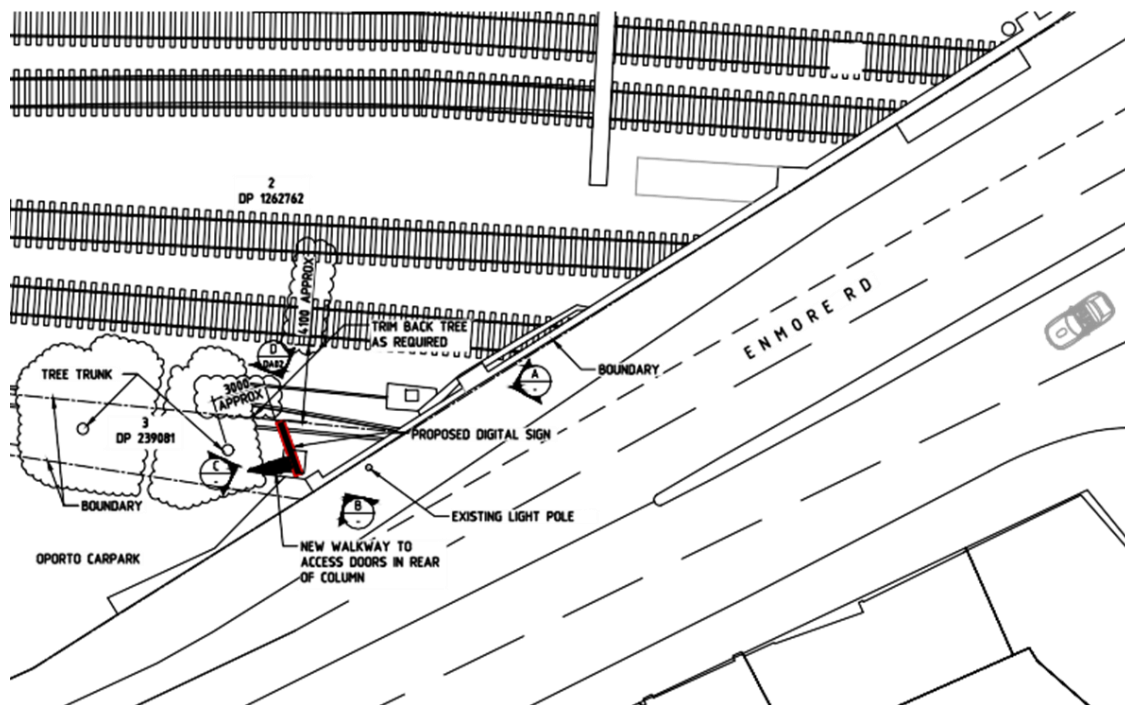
Site plan (Source: Dennis Blunt Consulting Engineers)
